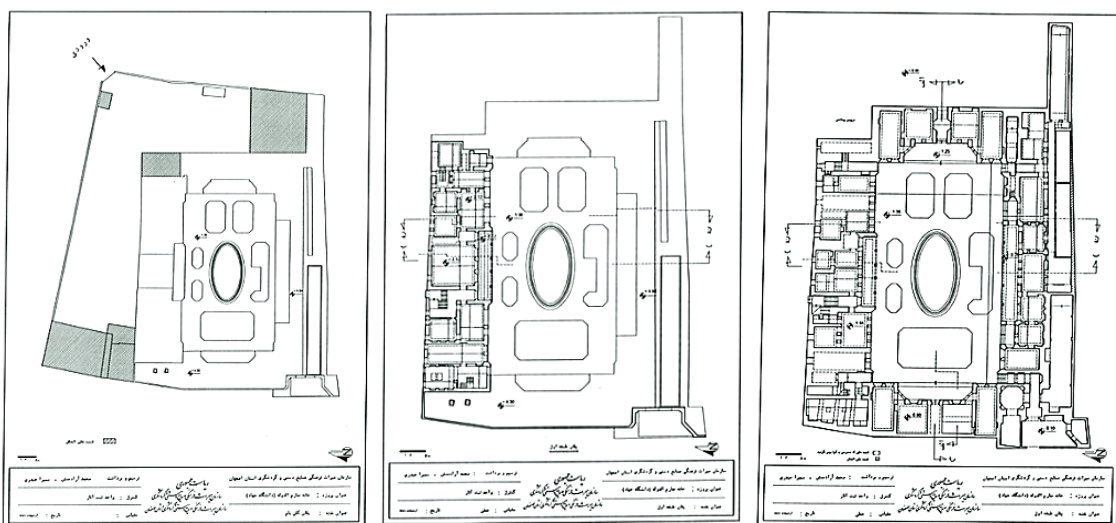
, 12, 13. Prince's Sarem al-Dowleh main residence, now Jahad University. Situation, ground floor plan and upper storey plan of the buildings, inventory drawings, the survey from 2007.
